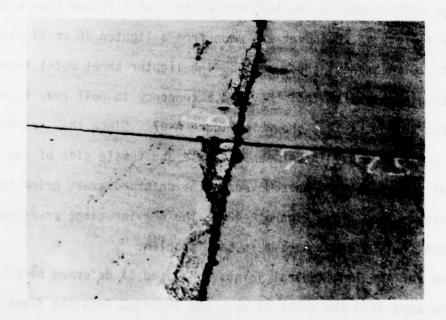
Typical Keyway Distress in Pavements in Apron Area, Spokane.
